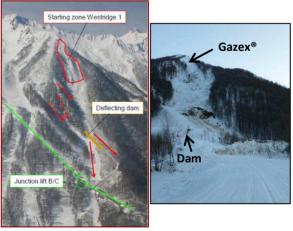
Deflection dam and avalanche from the starting zone Westridge 1 (Margreth, 2010)
